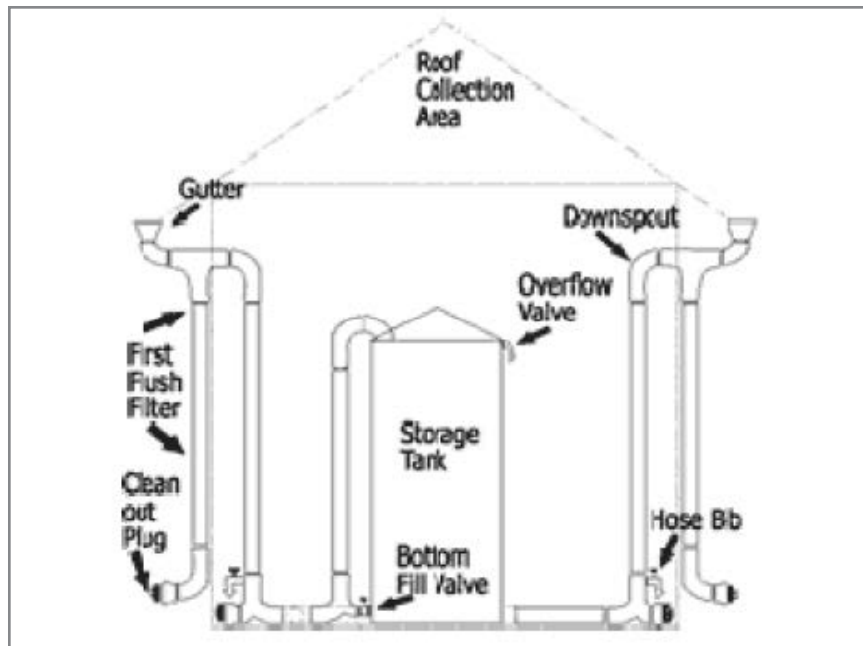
Complex water harvesting system (with roof catchment, gutter, downspout and storage tank. City of Austin Energy's Green Building Fact Sheet, 1995).
